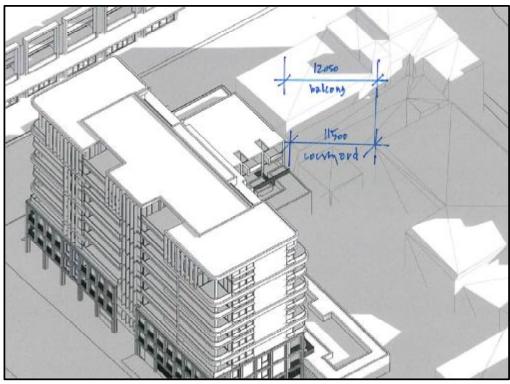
Level 1 and 2 Building Separation to 121-123 Corrimal St (\*Source: ADM Architects)
